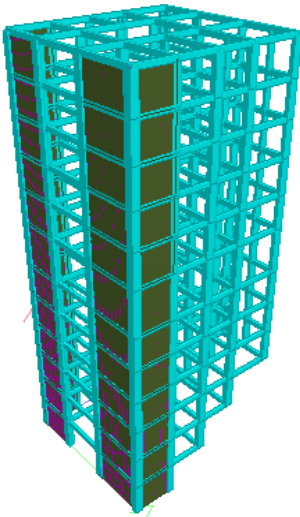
Isometric view of Hostel no. 05 with Shear Walls at corner
